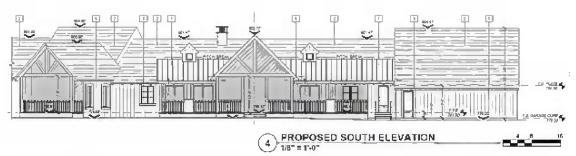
PROPOSED ACCESORY DWELLING UNIT ELEVATION
